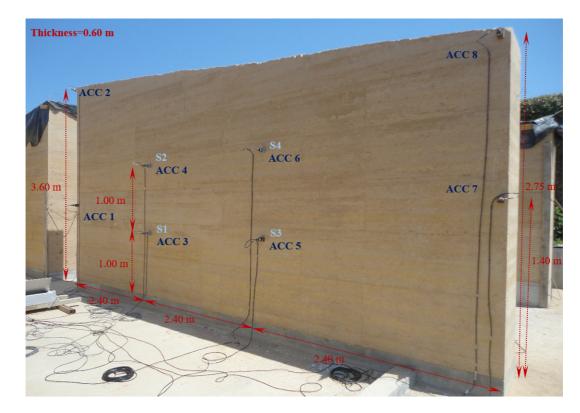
Rammed earth wall adopted for the non-destructive testing. (ACC<sub>i</sub> and S<sub>i</sub> correspond to the location of
